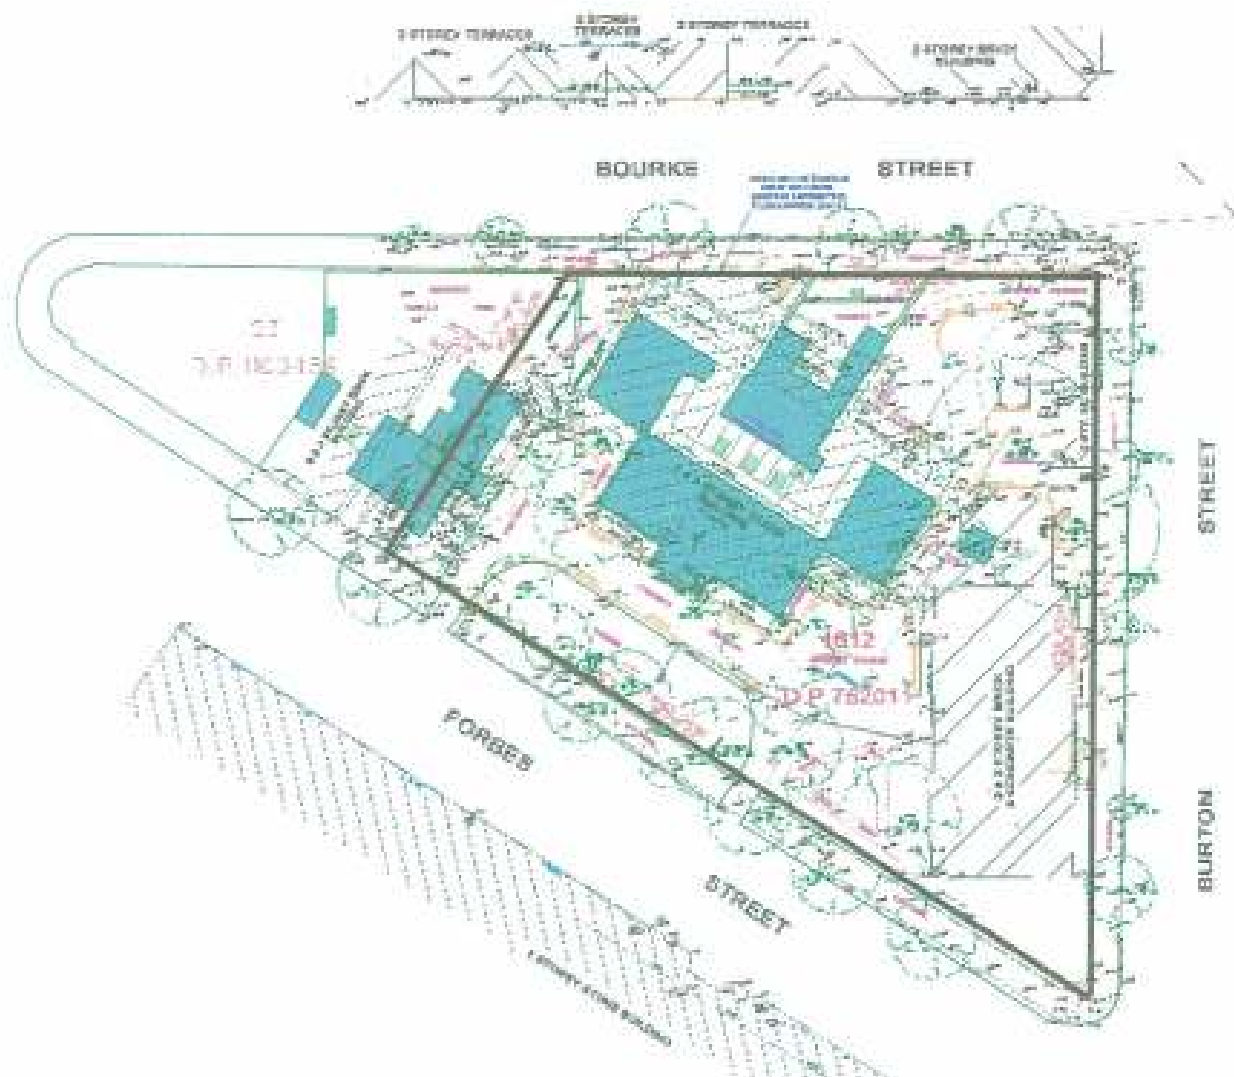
Scaled overlay of the current site survey and the 1901 Block Plan (shaded green).
